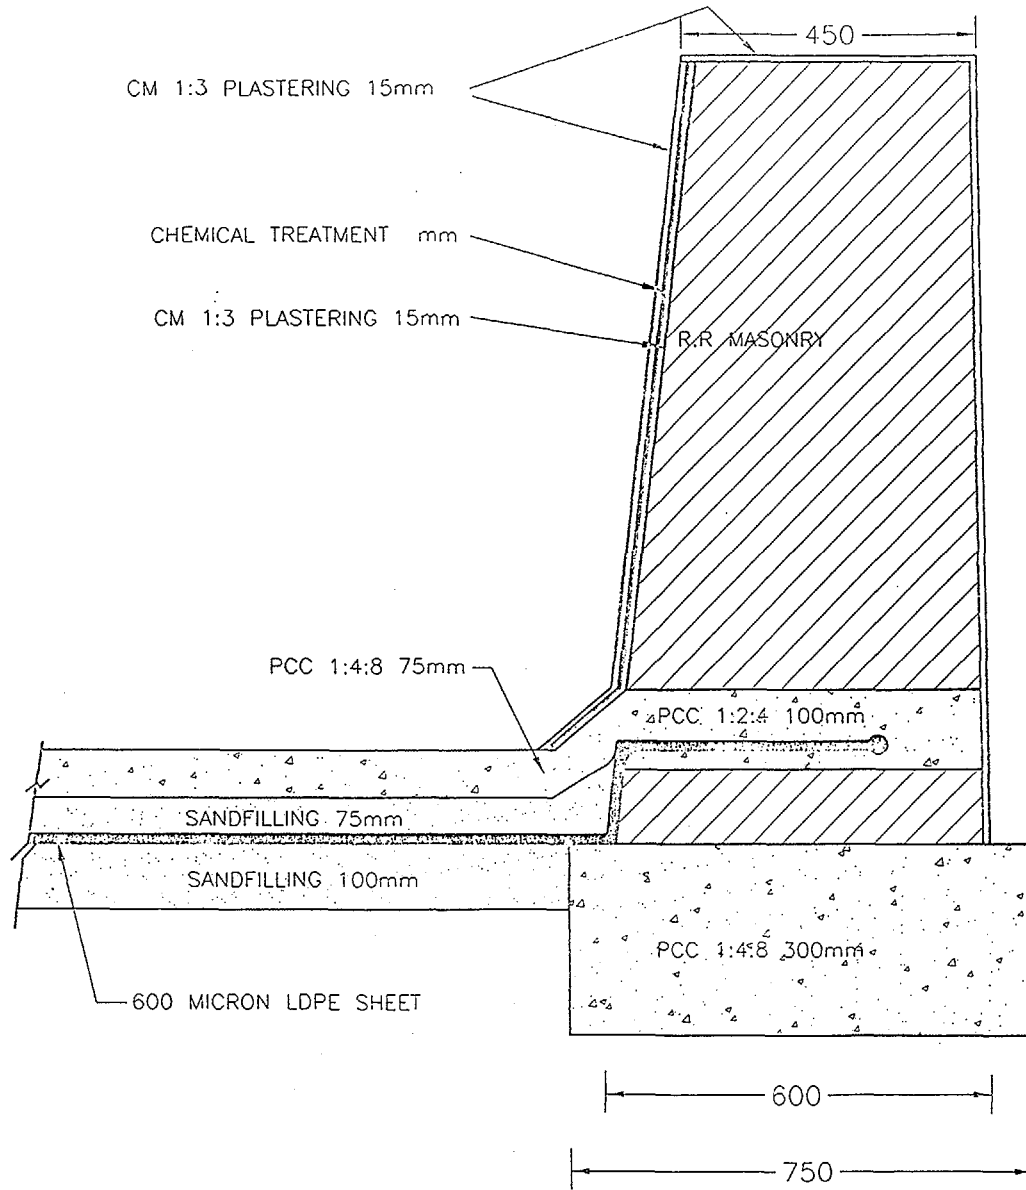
A CONNECTION DETAILS OF LDPE SHEET
